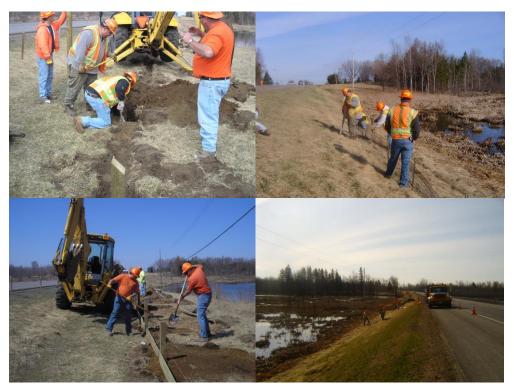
d: Construction of Causeway Barrier 1. The left panel shows installation of the wooden barrier, and the right panel shows installation of the vinyl-coated metal fence.
